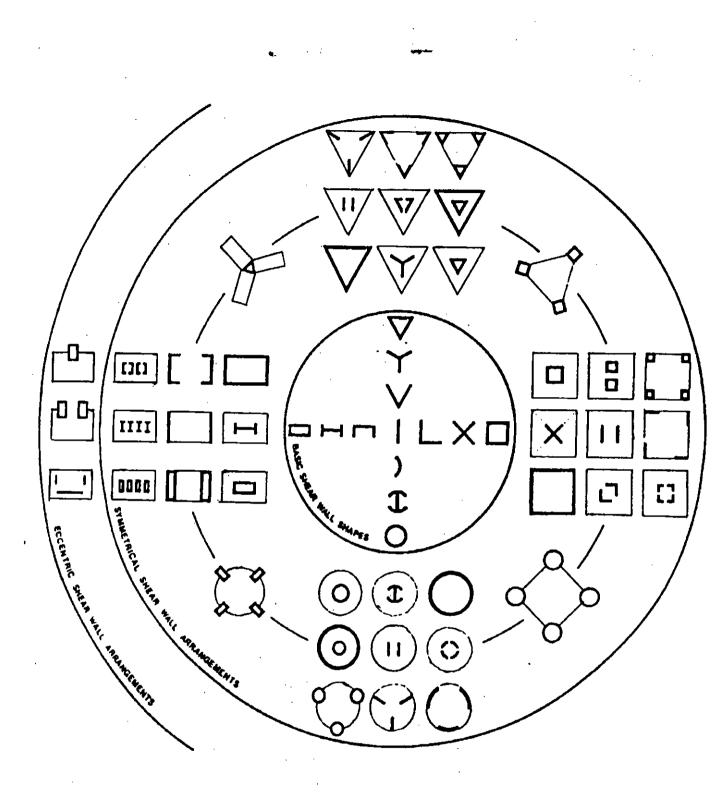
Various configuration of shear walls that are used in high rise buildings.
